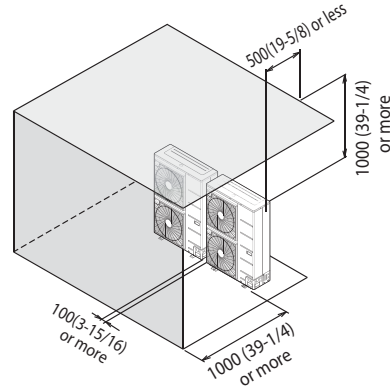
Side by Side—high rear wall and low front wall with no side walls
